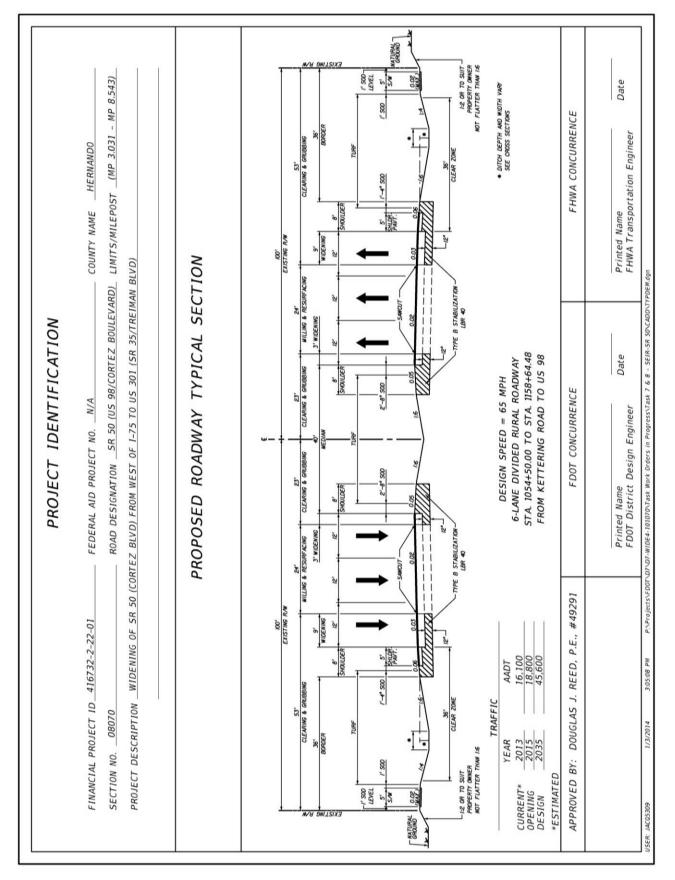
Proposed Roadway Typical Section STA. 1054+50.00 to STA. 1158+64.48
